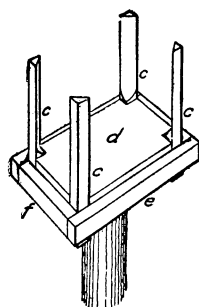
Floor and posts added to foundation shown in figure 13.
